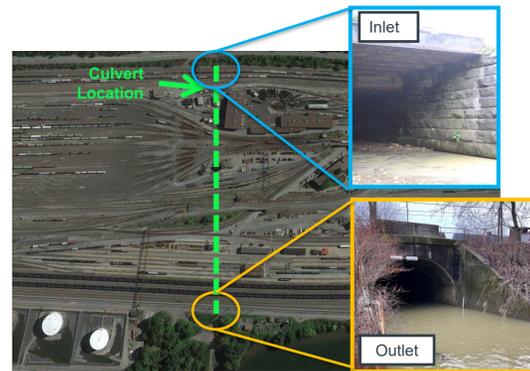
Site Layout. Approximate location of culvert is shown as green dashed line.
